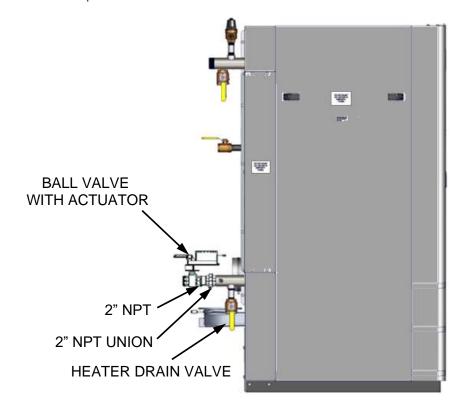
Innovation Water Heater Equipped with Sequencing Valve
